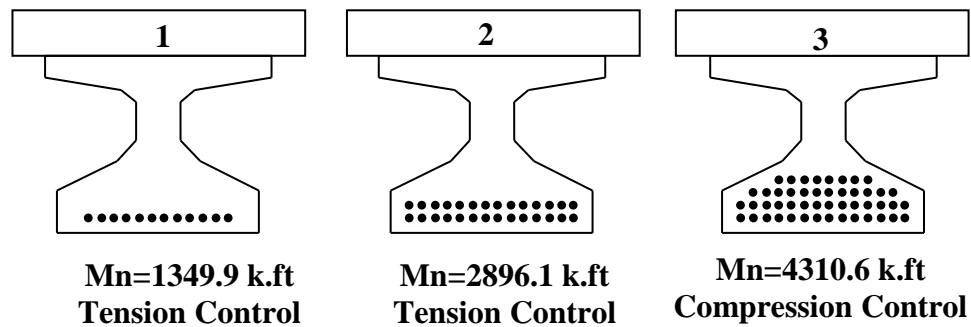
Over Designed Sections for Compression Controlled Failure
